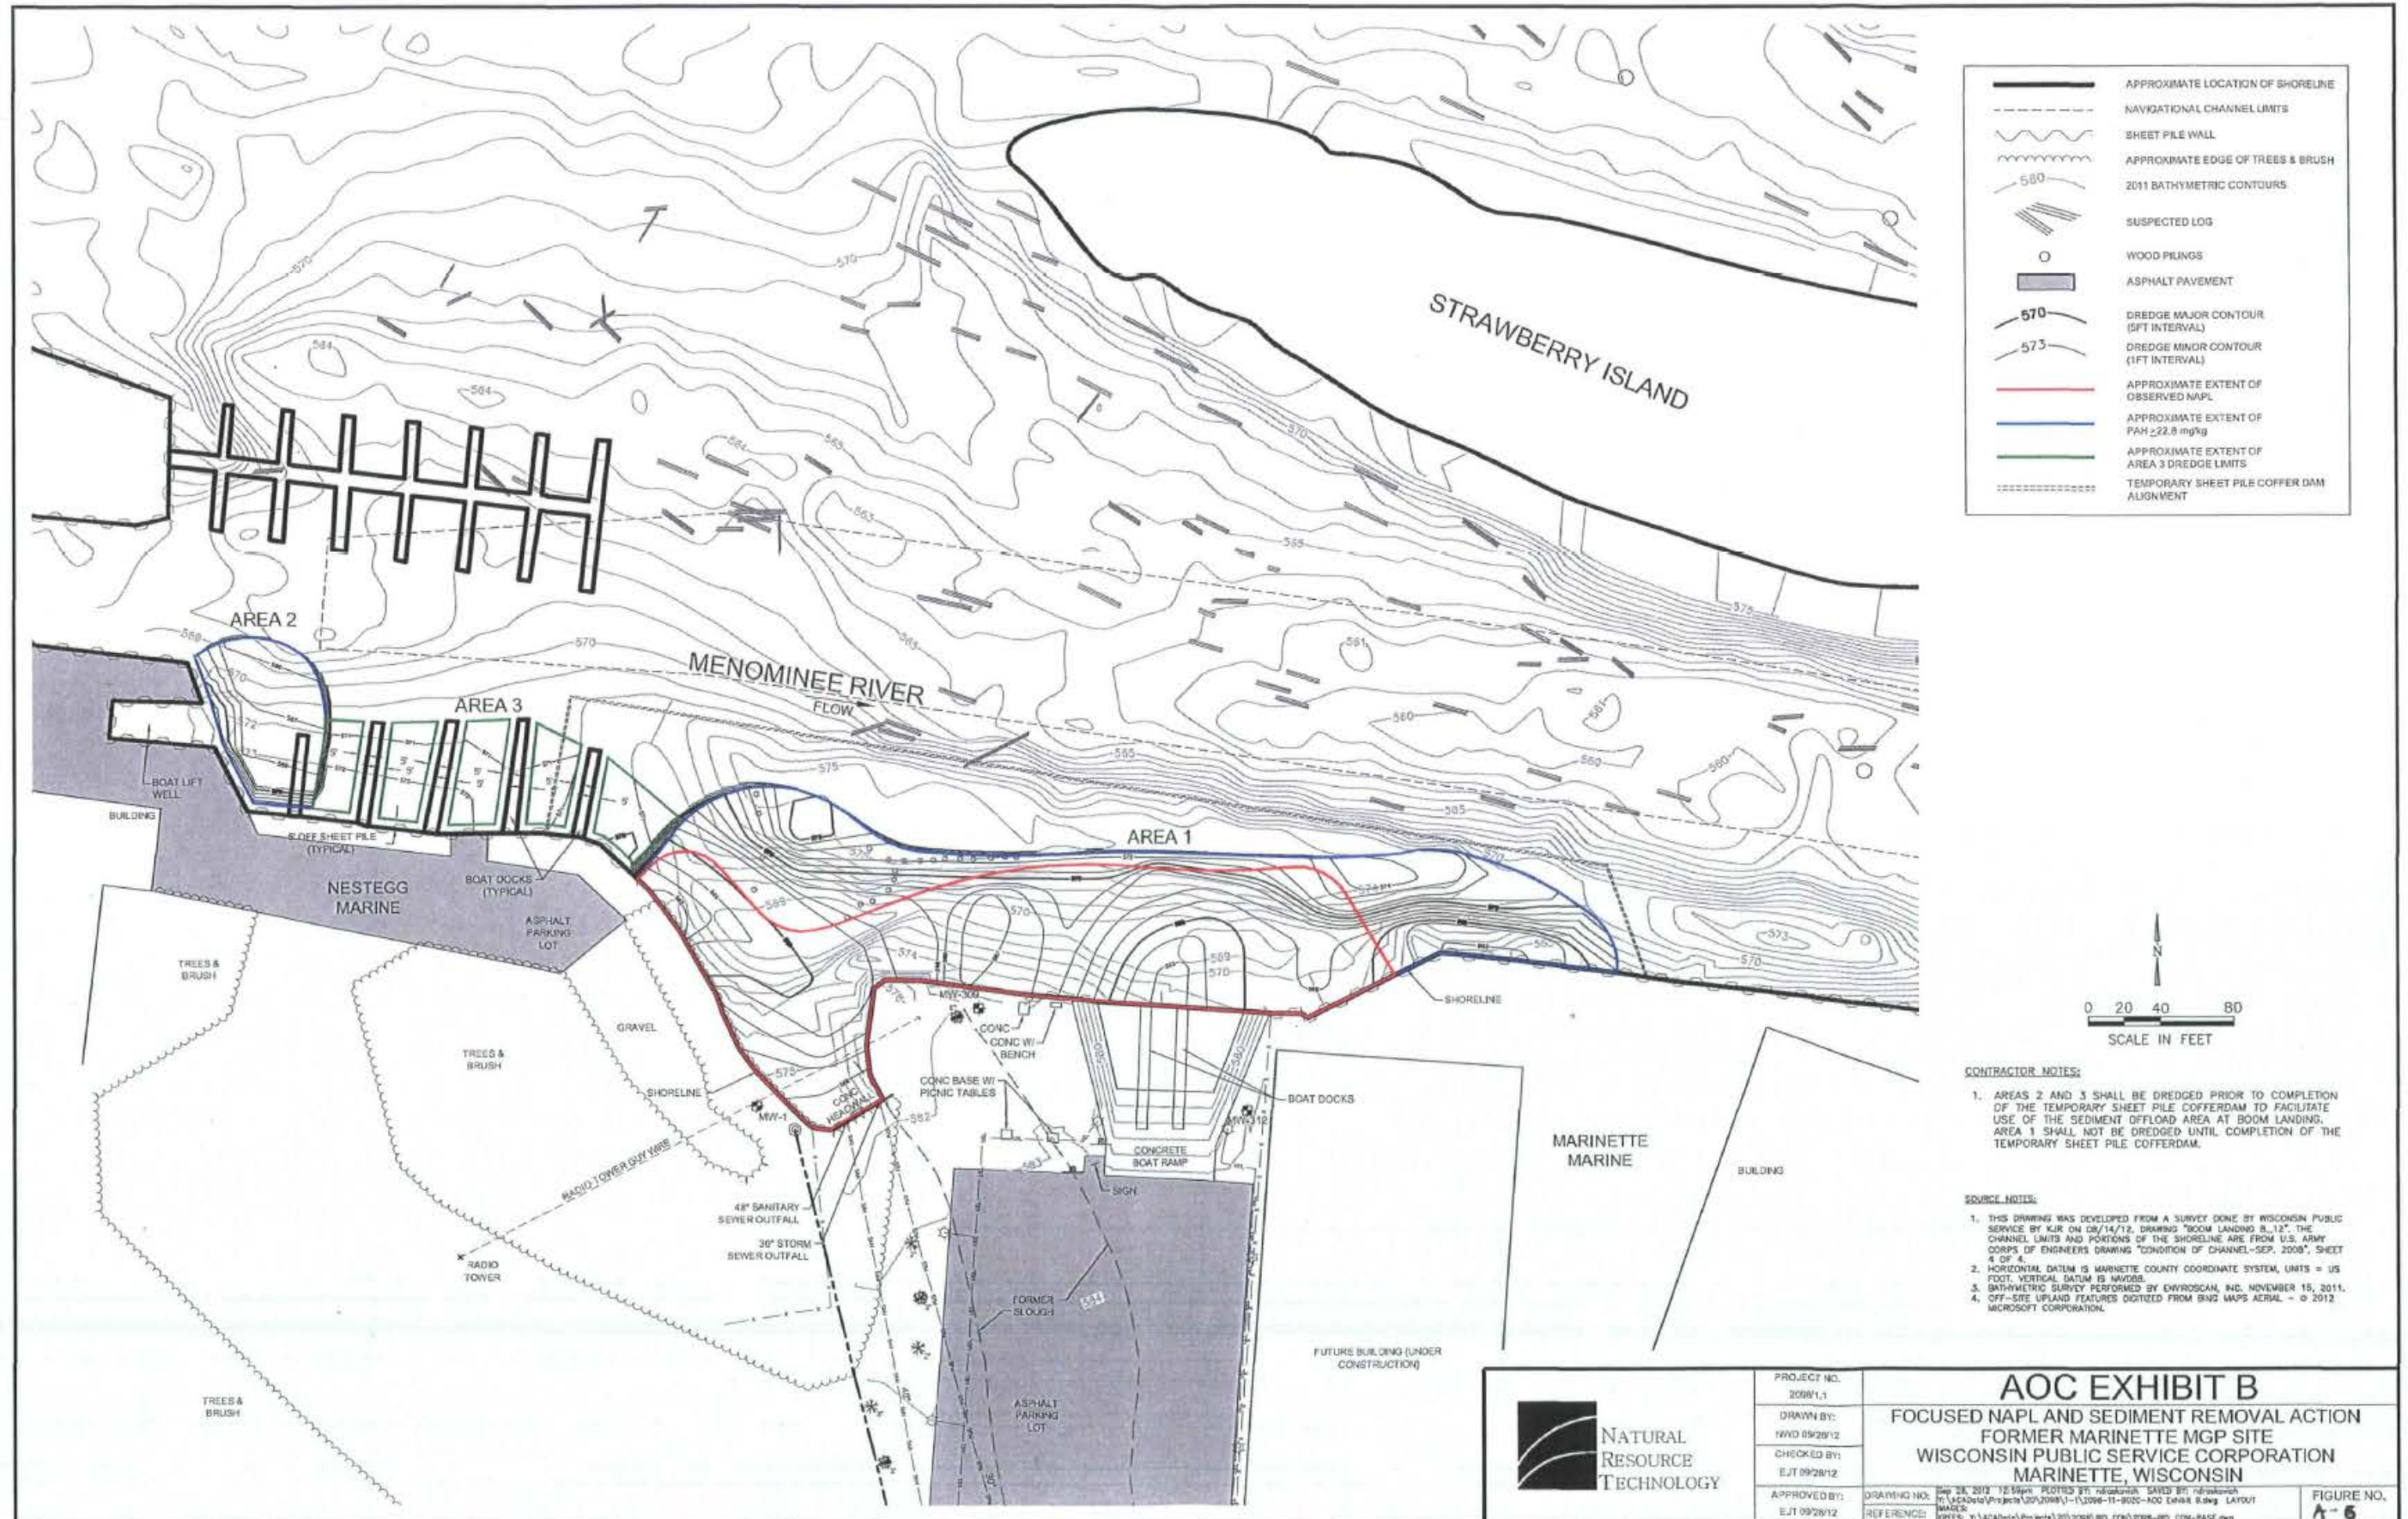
Figure I. WPSM Site, location of the NAPL (area 1) and PAH (areas 2 & 3) coal tar contamination. Also note steel sheet pile cofferdam to be installed prior to excavation of NAPL laden sediment.
